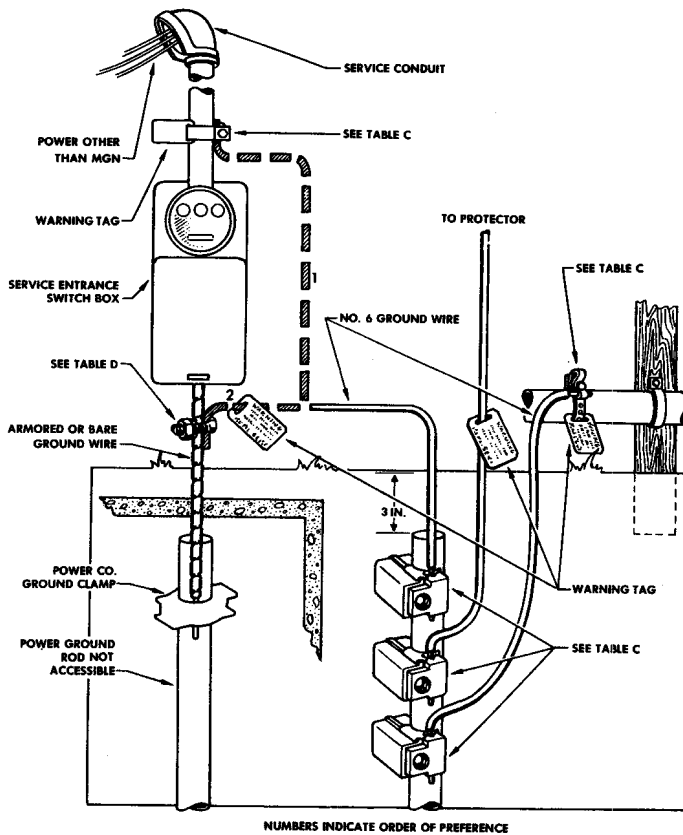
Power Other than MGN Grounded to Inaccessible Ground Rod—Unacceptable Interior Water Pipe
